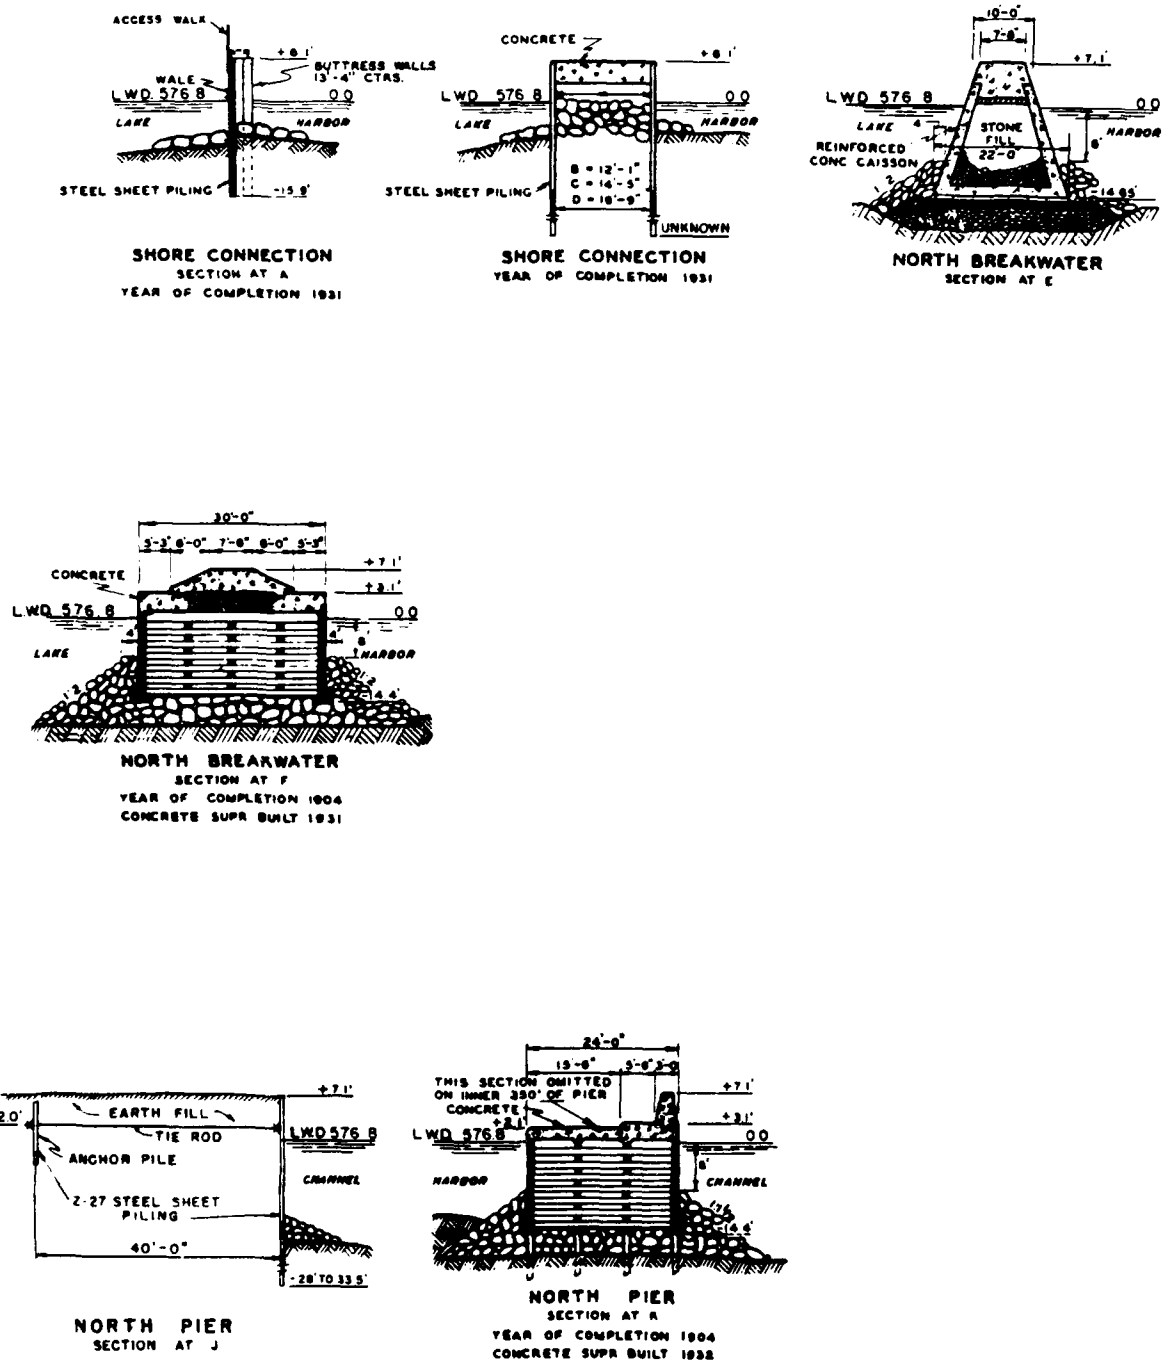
Typical structure cross sections, Waukegan Harbor, Illinois
